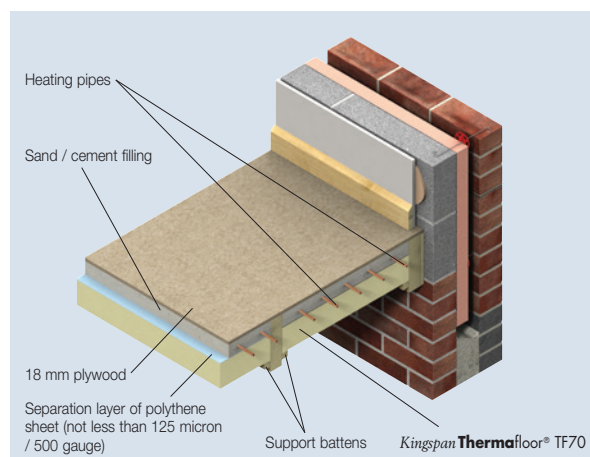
Intermittent Heating Applications – Suspended Timber Floor
